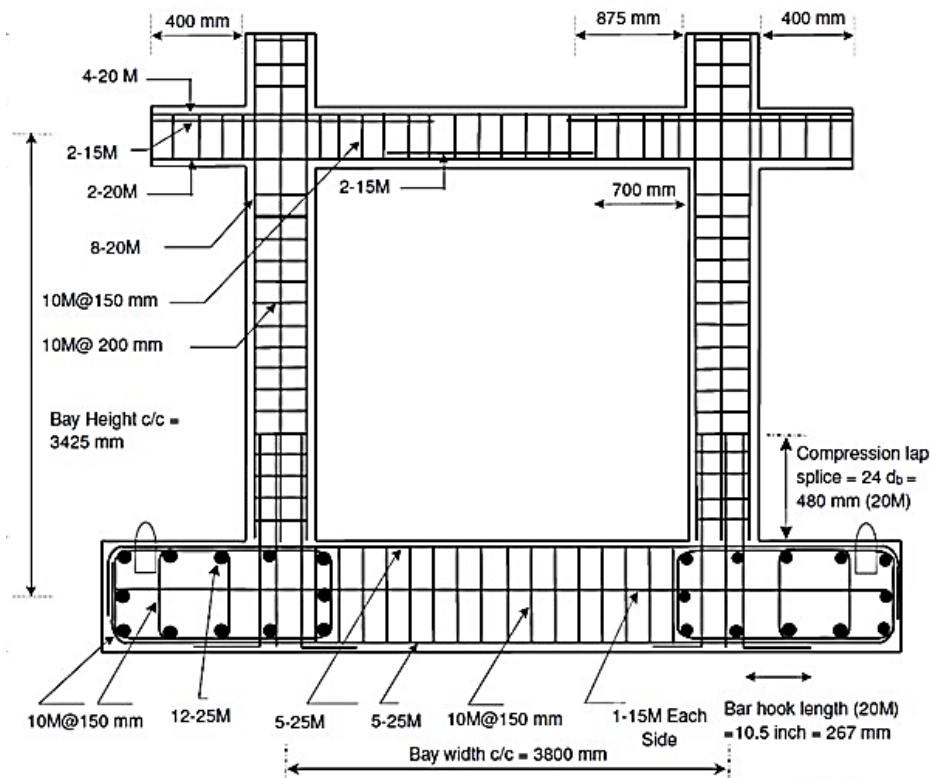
Reinforced concrete frame details (Al-Sadoon, 2016)
